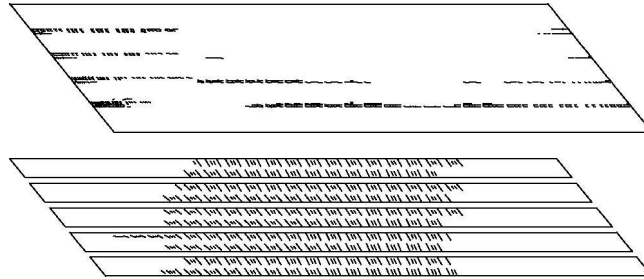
Skew viaduct phase 2 – crack pattern at bottom side of joints (top) and girders (bottom)
